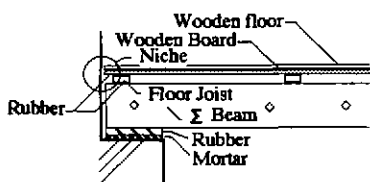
Detail of floor structure (Cond#3 &amp; 4)
